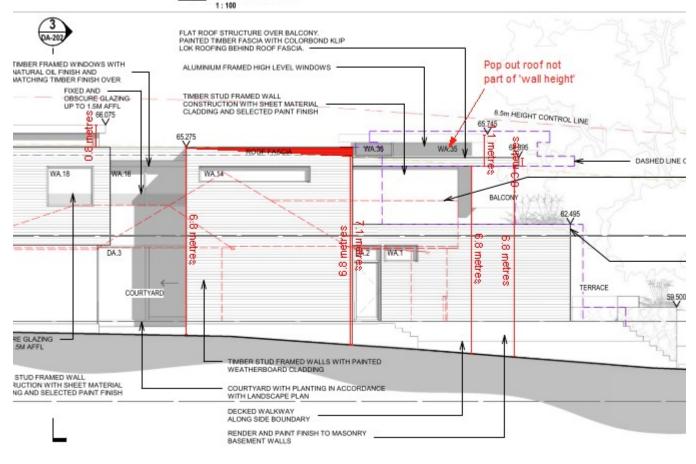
East elevation of 27 Alan Avenue showing area of wall height non-compliance.
